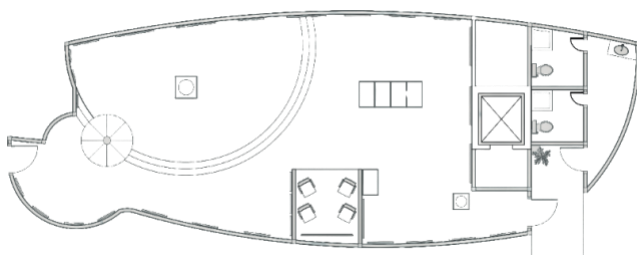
Affandi's 3rd Gallery Interior and Floor Plan
